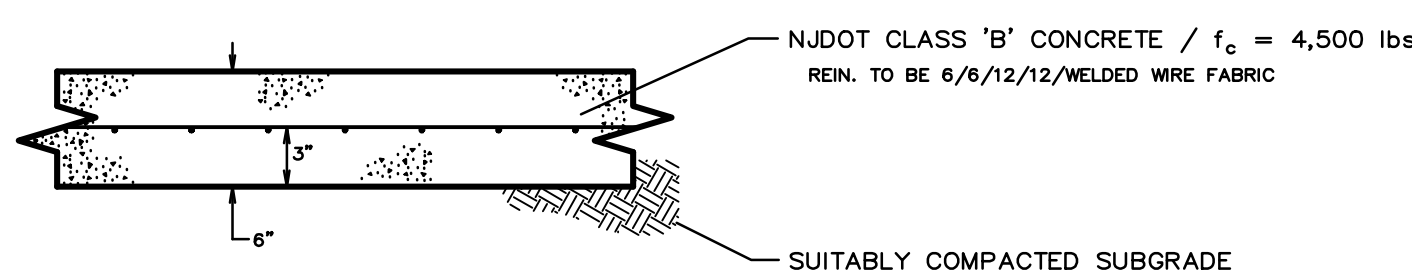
DETAIL: N.J.D.O.T. WHITE CONCRETE CURB AND PAVEMENT
